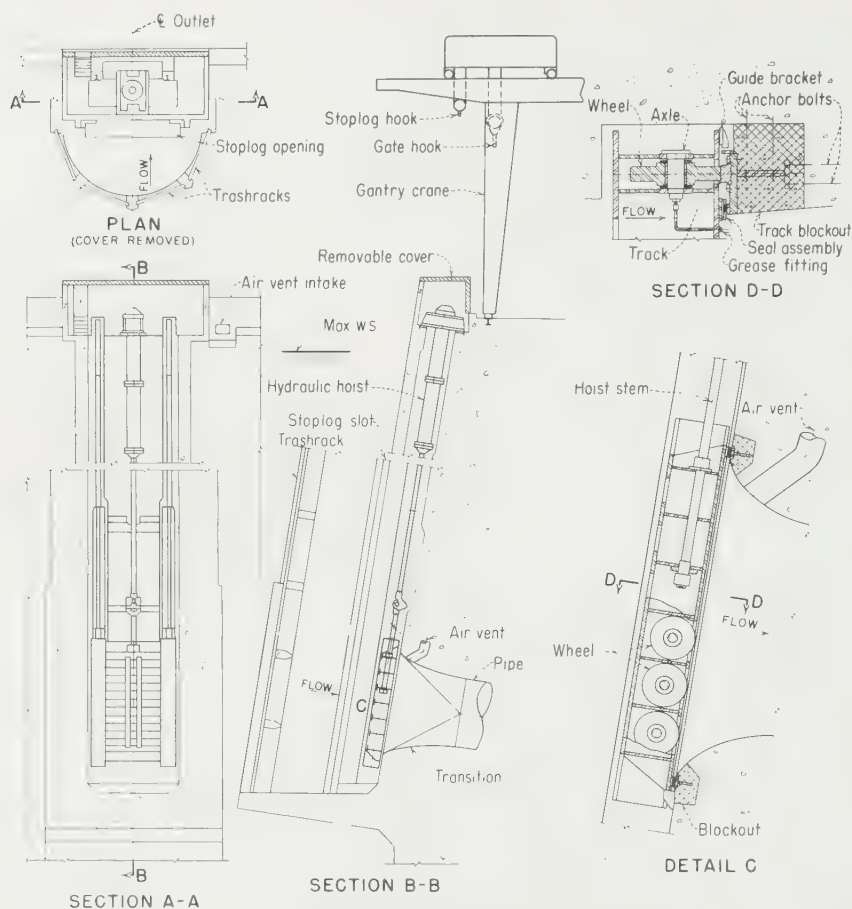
Typical installation of wheel-mounted gate on the sloping upstream face of a dam.
